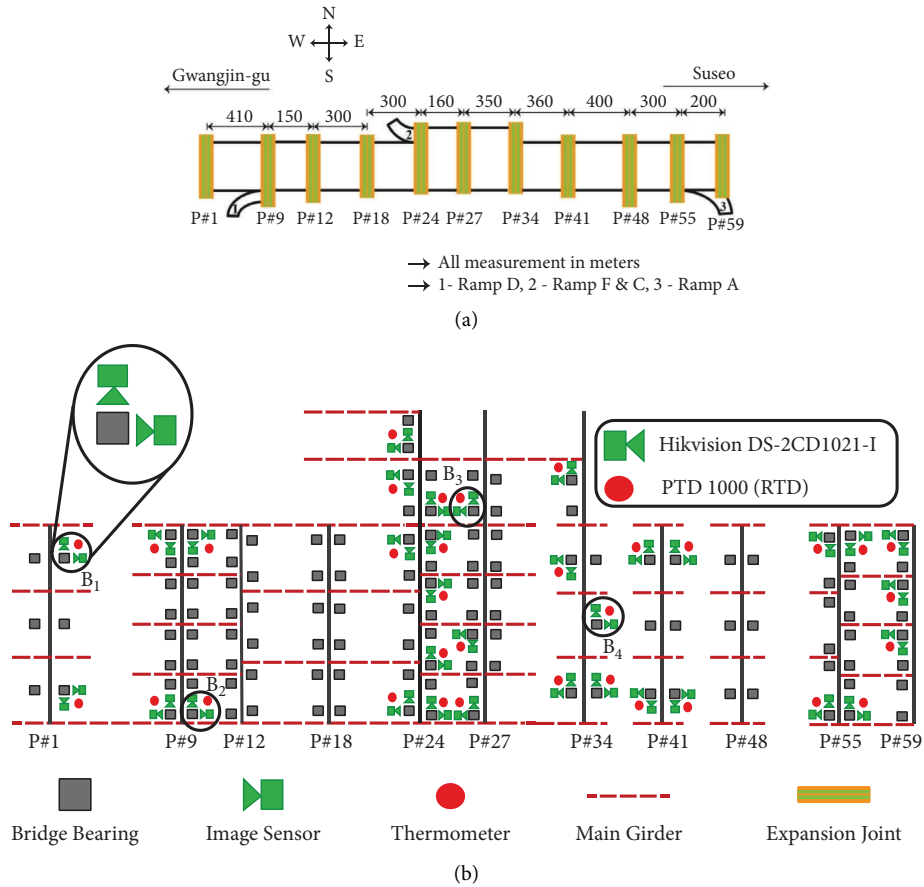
Sensor layout on the bridge [66]: (a) bridge layout and (b) sensor locations.
